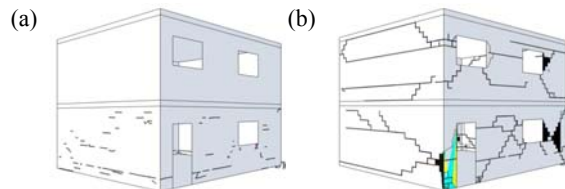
Damage in (a) reinforced and (b) unreinforced masonry buildings
